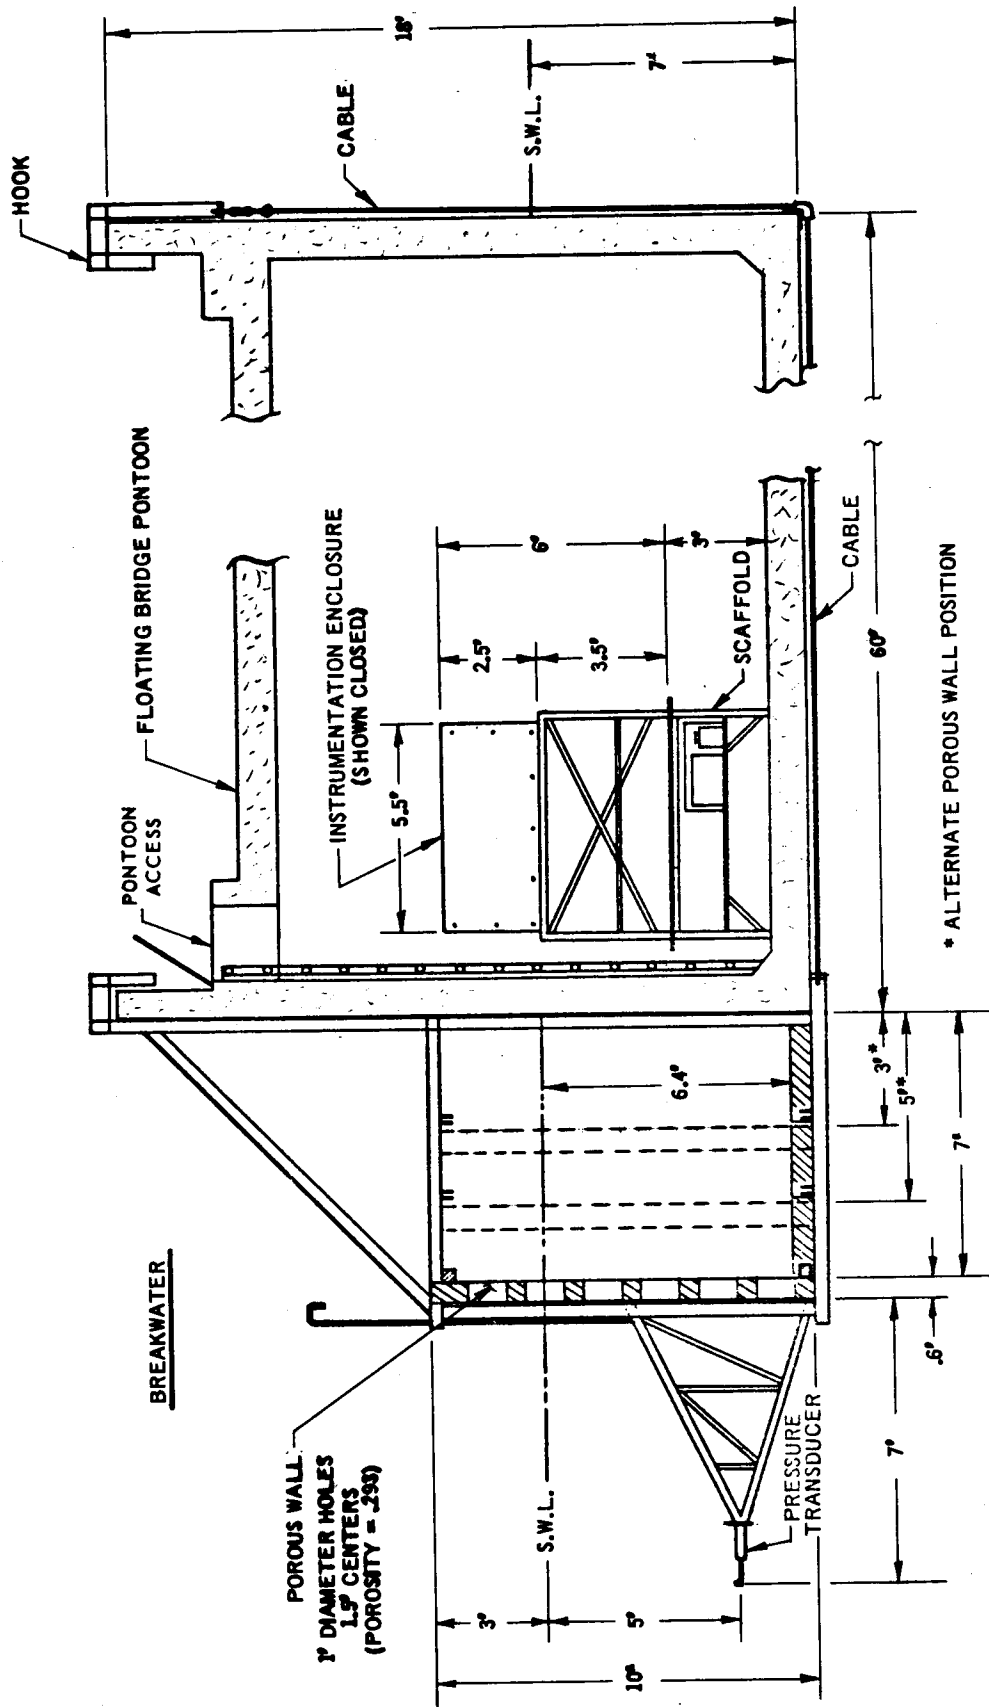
BREAKWATER SCHEMATIC (SECTION VIEW) INCLUDING KEY DIMENSIONS.
